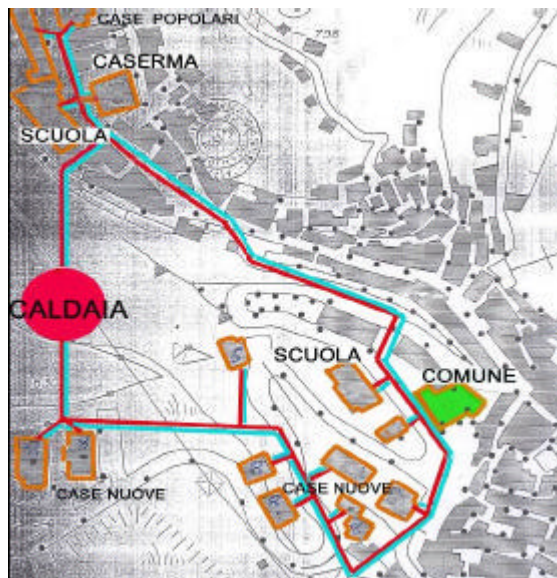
Castronuovo Sant'Andrea district heating plan.
